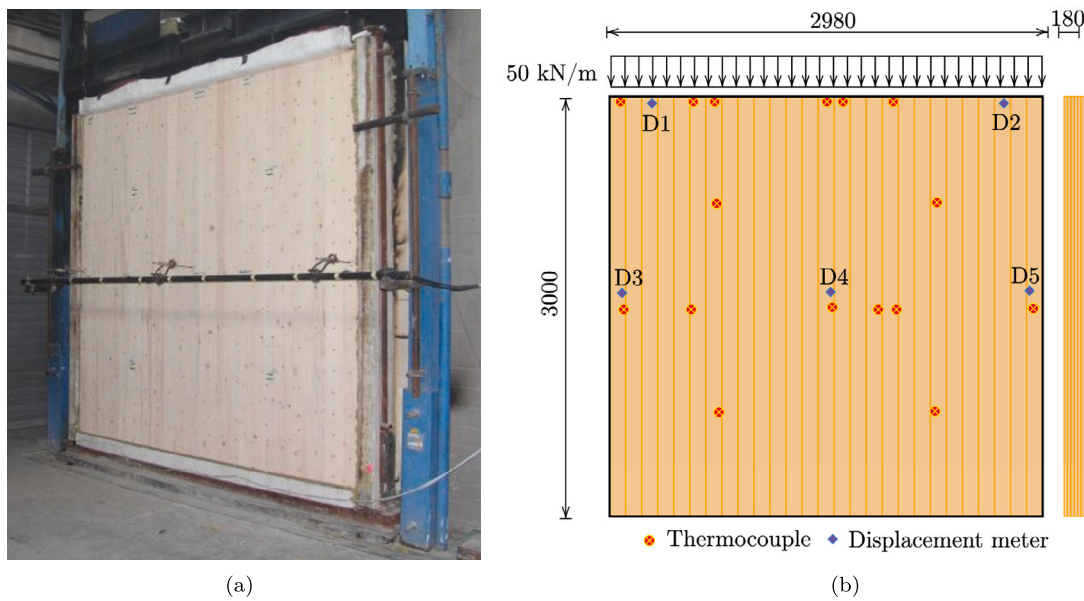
(a) View of the unexposed side of the WDCLT panel before the fire tests; (b) experimental setup.
